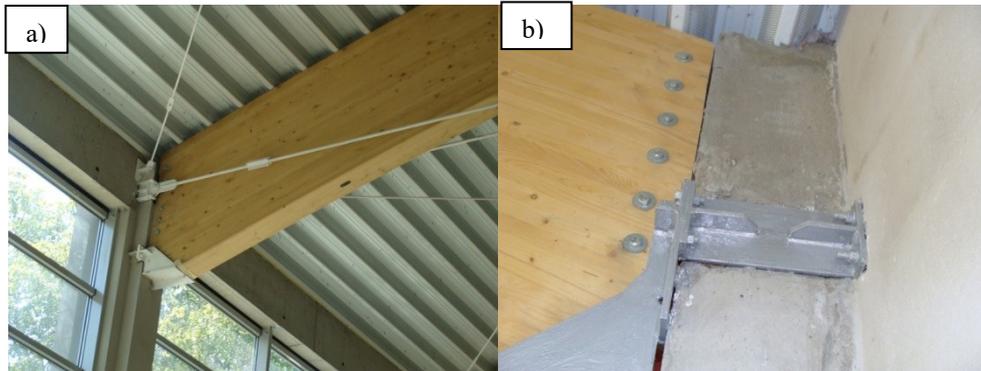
The method of attaching the timber roof girder a) to the reinforced concrete column in the axis 10, b) to the reinforced concrete column in the axis 5
